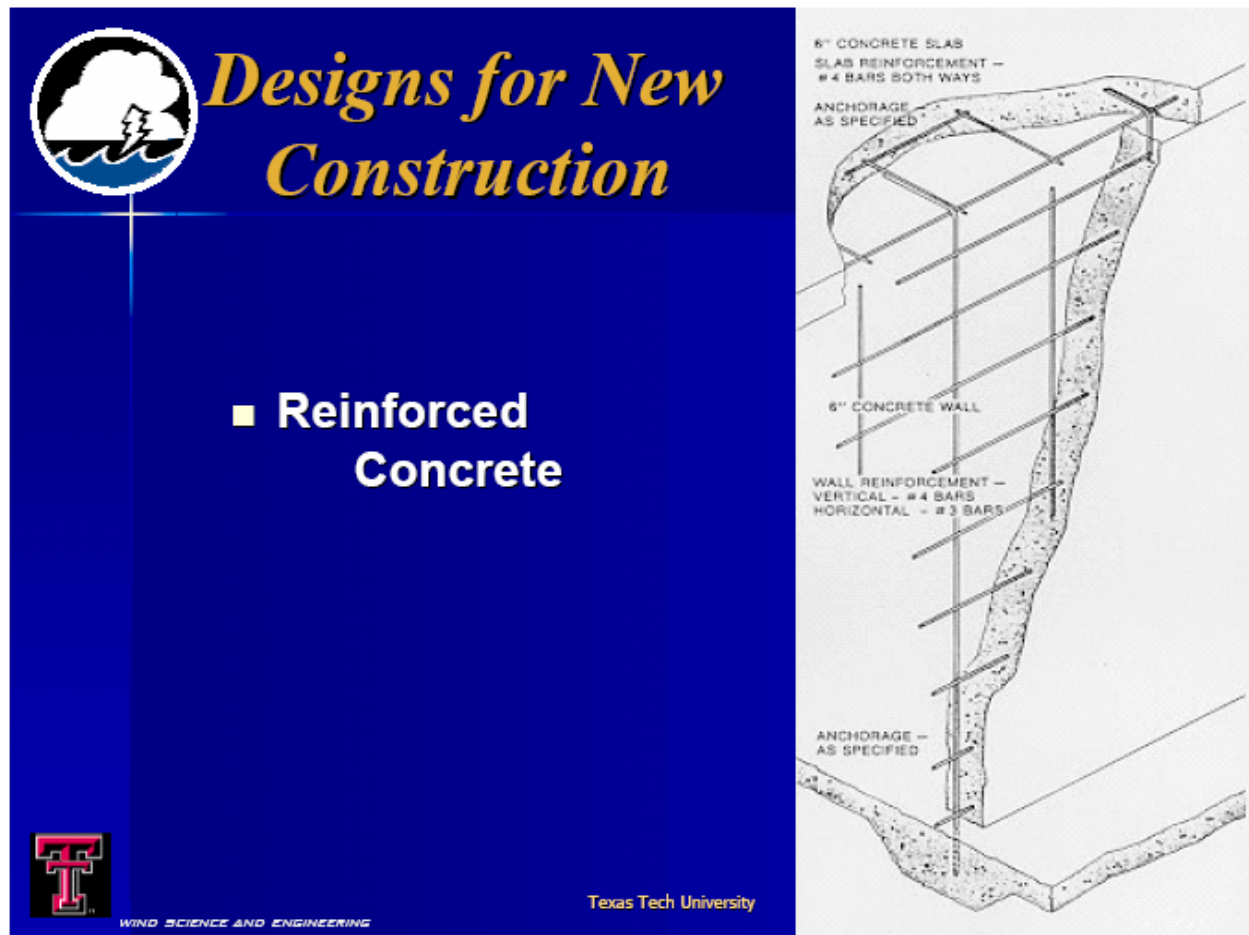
Typical slide depicting a reinforced concrete shelter design.
